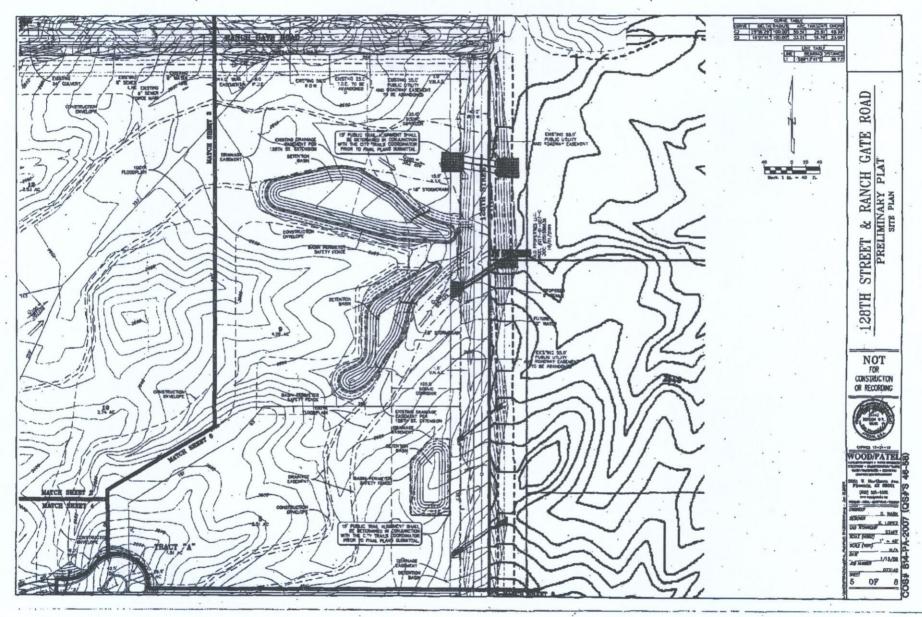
EXHIBIT A TO ATTACHMENT 1 SUBDIVISION PLAT
